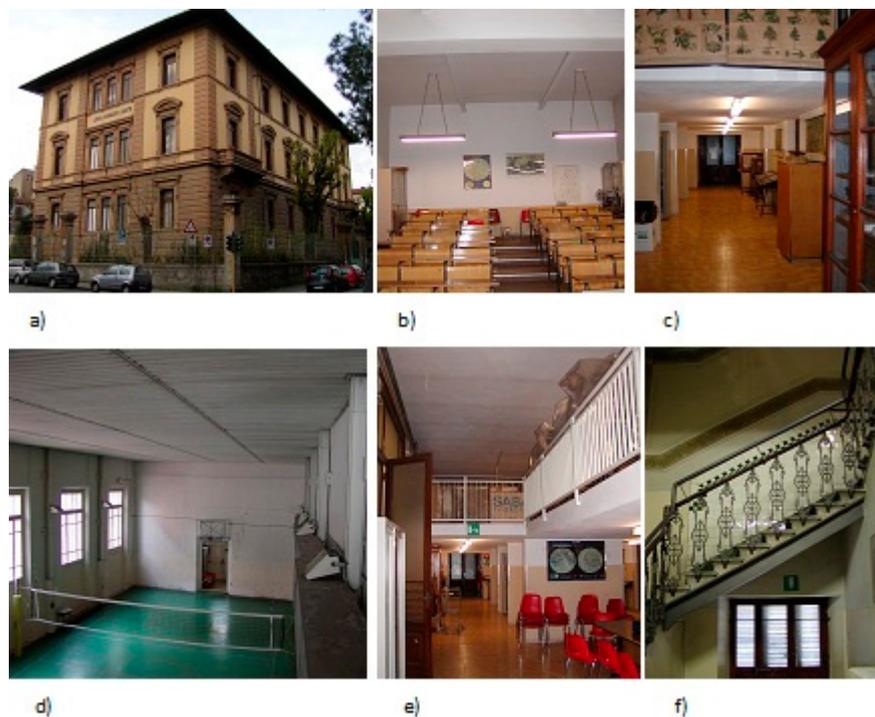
Photos: (a) images of the Dante High School building; (b) a typical classroom; (c) a corridor on the first floor; (d) the gym; (e) entrance hall, collective space; (f) entrance staircase to the first floor.
